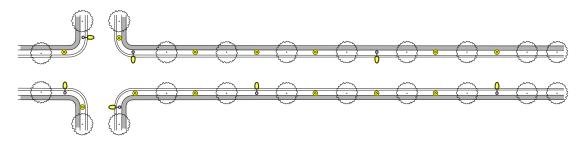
Typical Local Street with Non-Continuous Street and Continuous Pedestrian Lighting Plan
